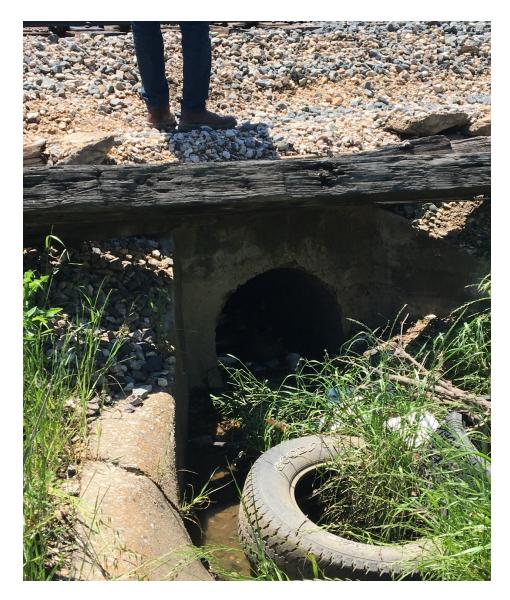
photo show a street drainage culvert that runs under the track and directs storm water run-off towards Echo Lake. Photo shows the drainage swell clogged and littered with trash, vegetation and debris.
